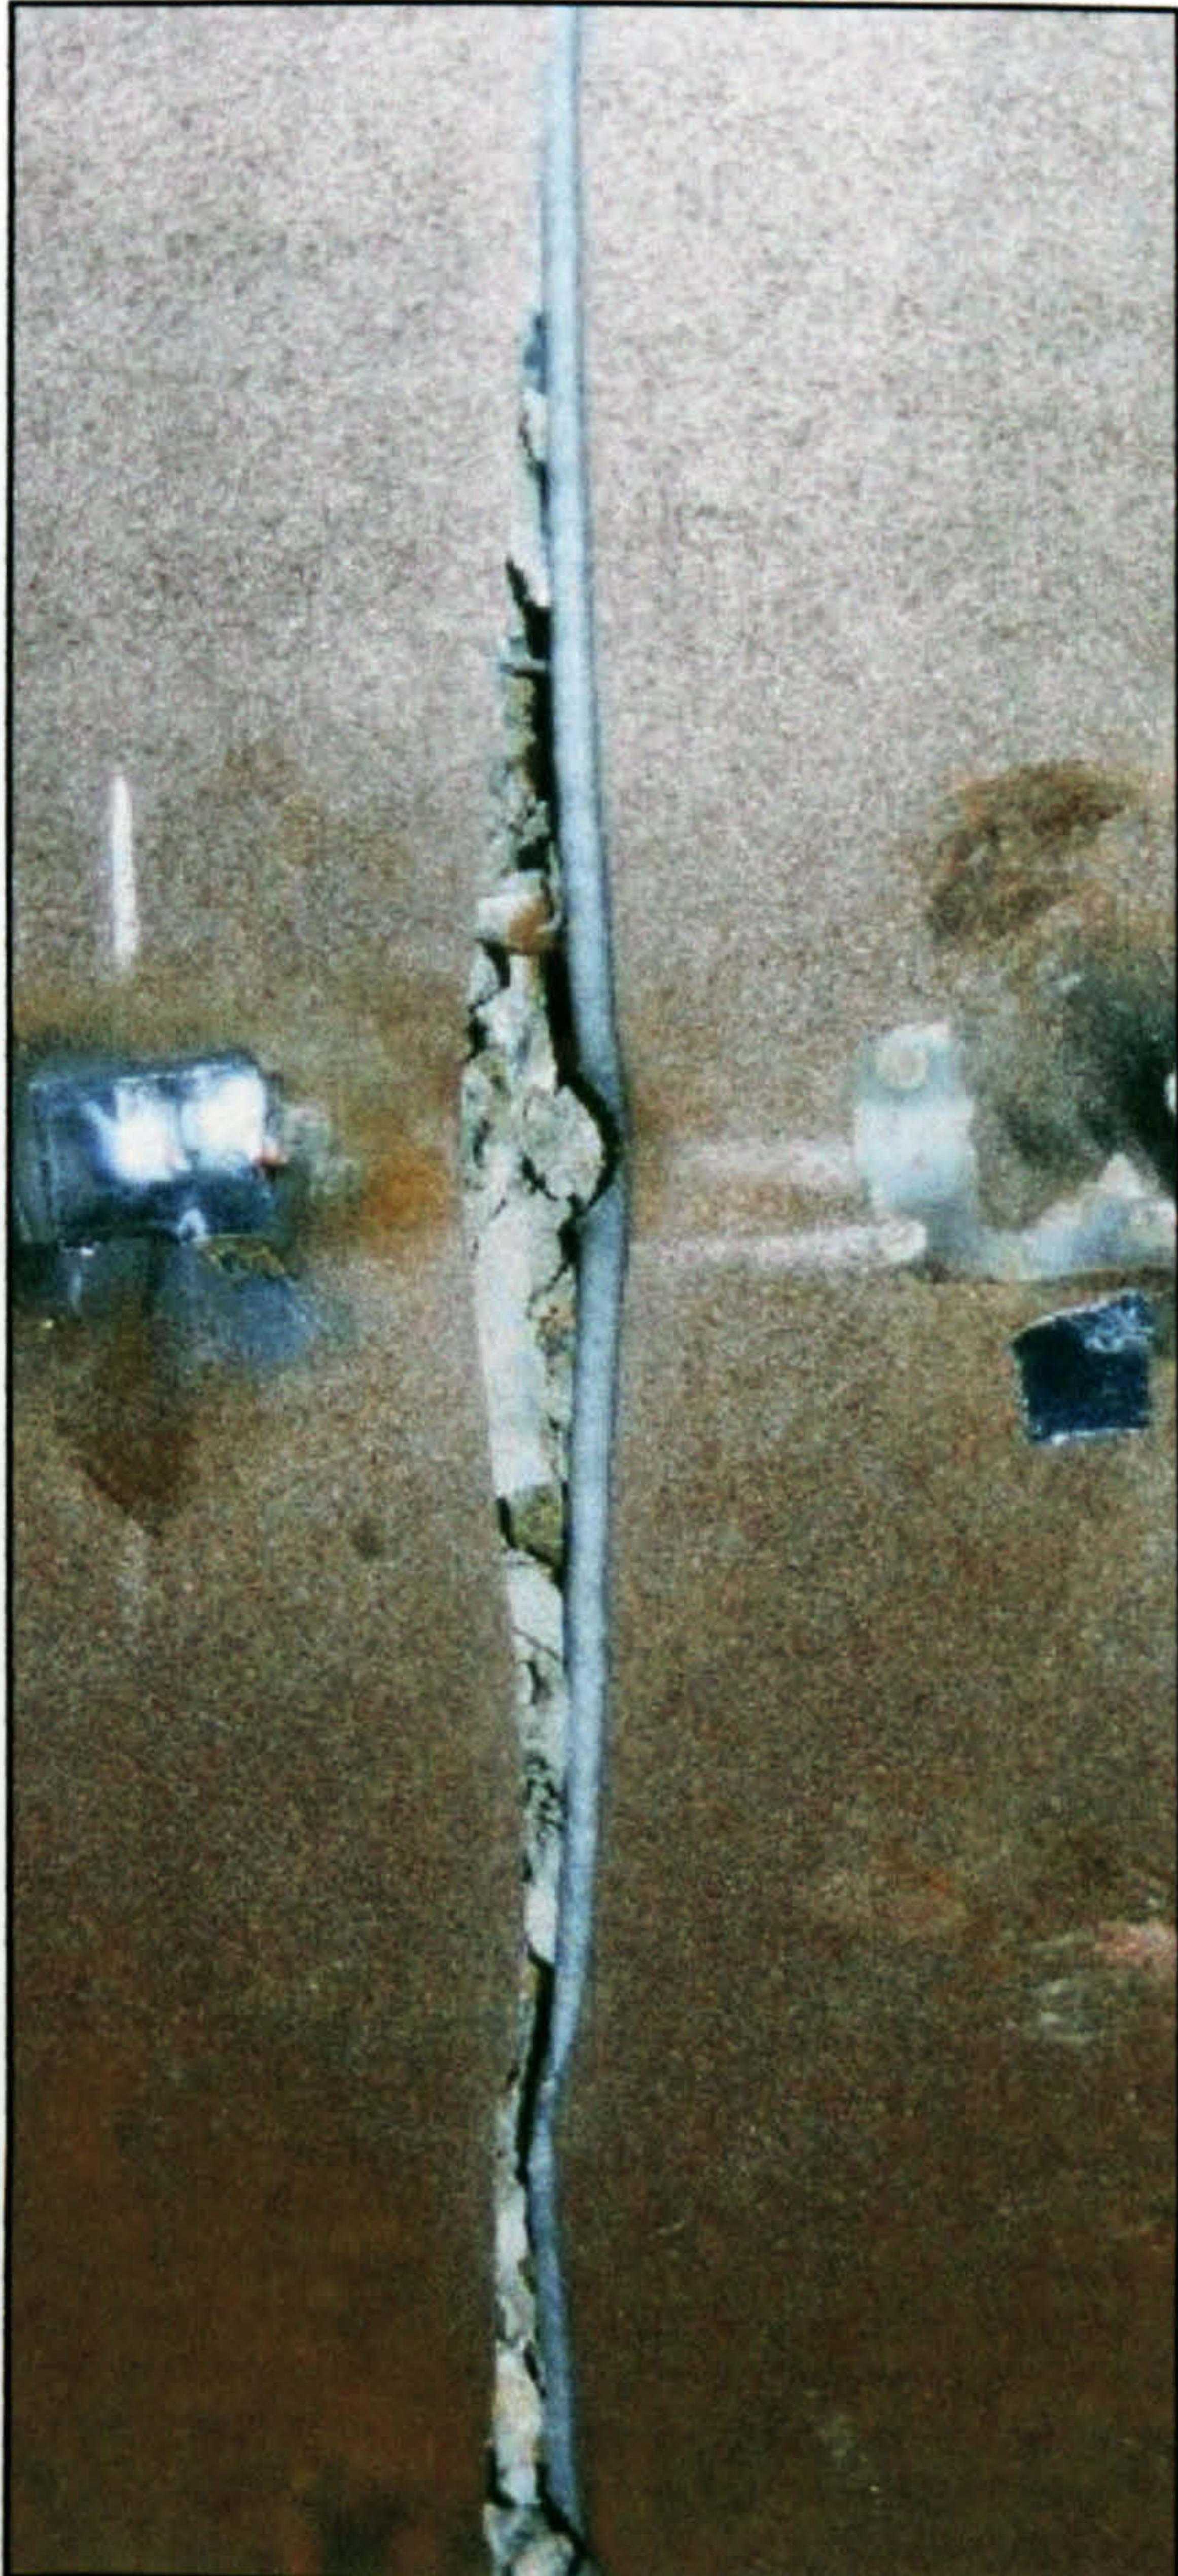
Close-up of failed area showing tension failure of the lower plate. At the centre of the picture it can be seen that failure has initiated from the weld of the shear connector, indicated by the crescent shape within the crack.
